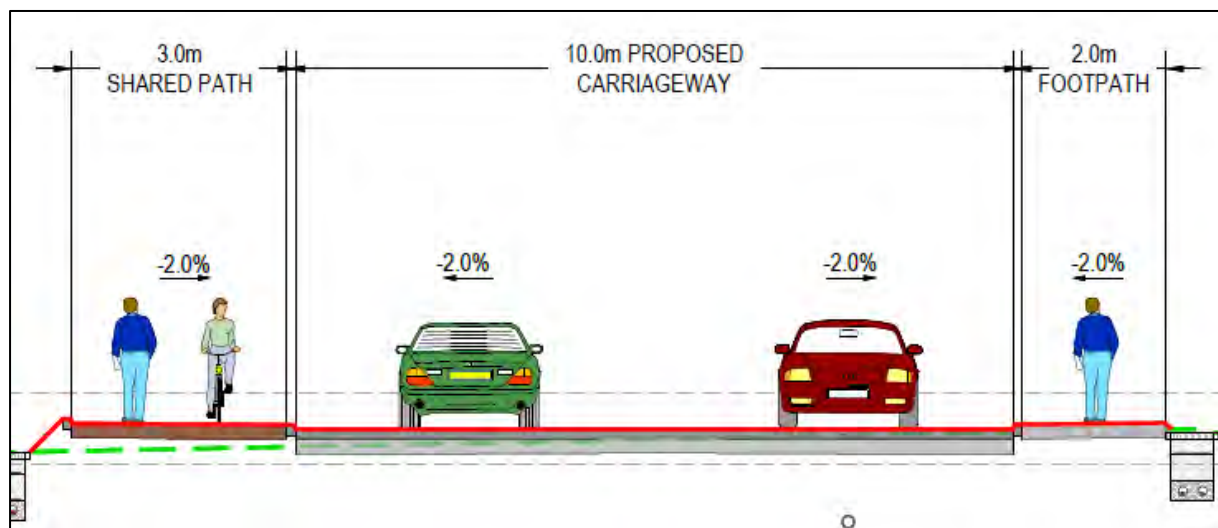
Zone A – Cross Sections of Proposed Access Road.
